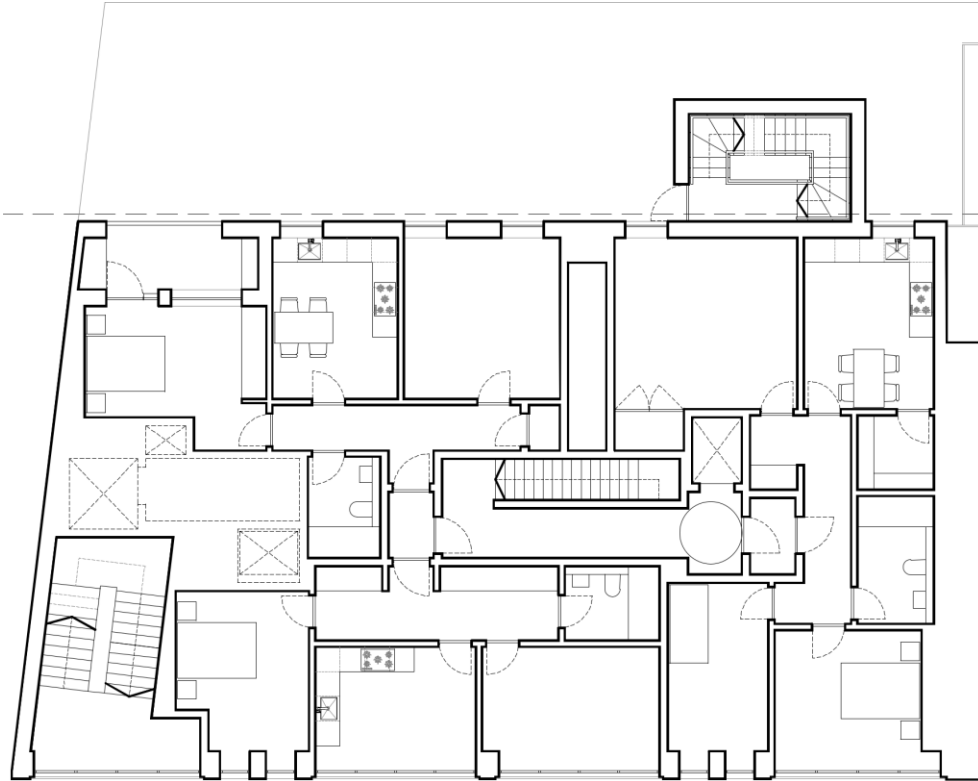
Proposed first floor plan illustrating the residential dwellings.
